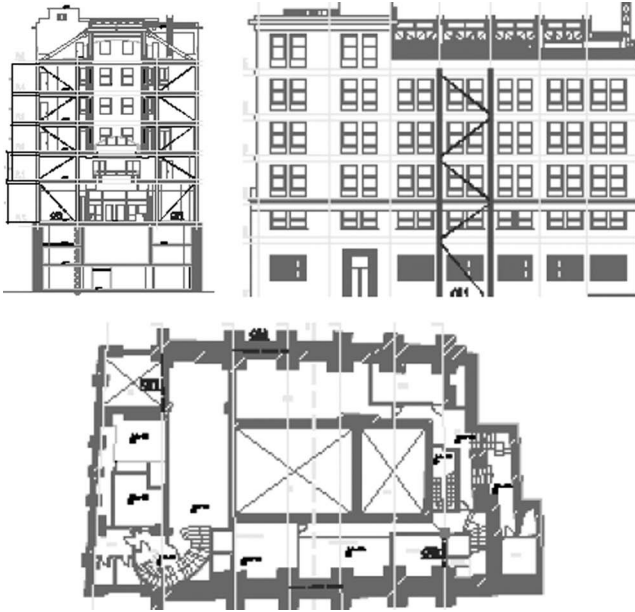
The seismic retrofitting of the Deutsche Bank building in Naples by means of the BRB-bracing system.
